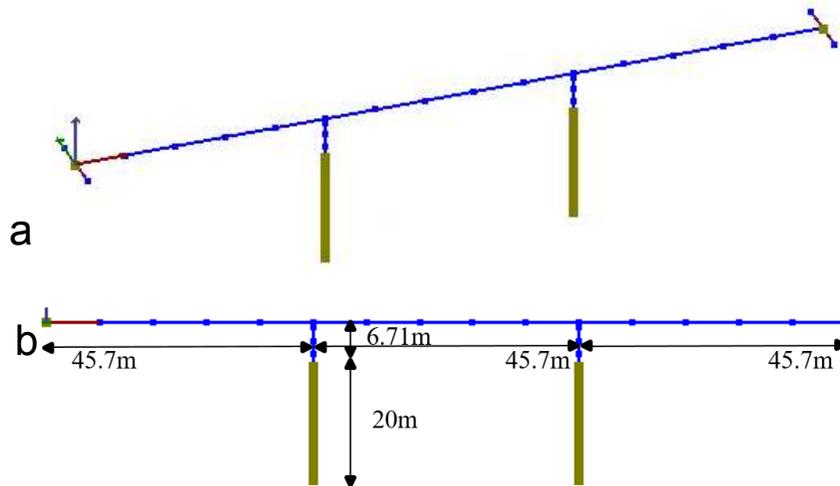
Finite element mesh: (a) 3D view, (b) elevation view
